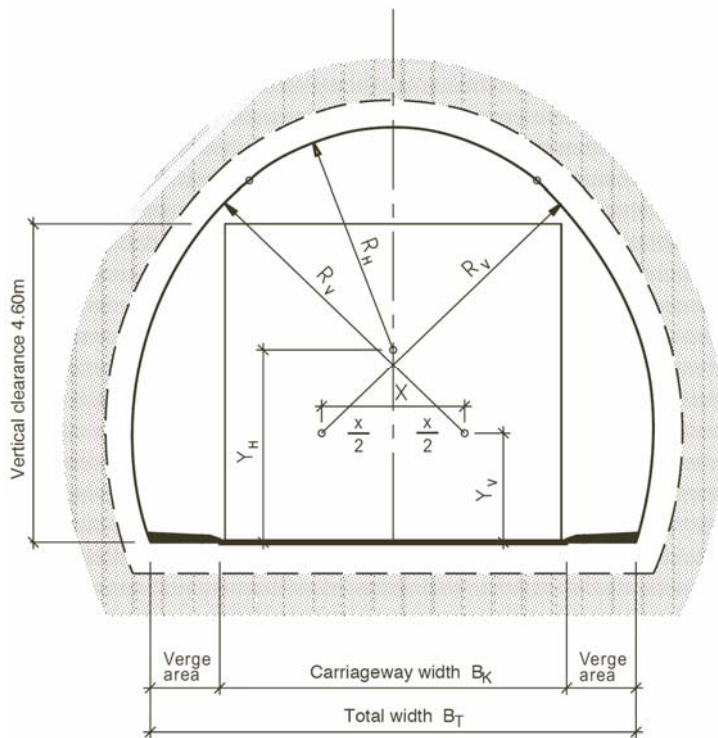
Dimension parameters of Norwegian road tunnel profiles T4 to T8.5.
